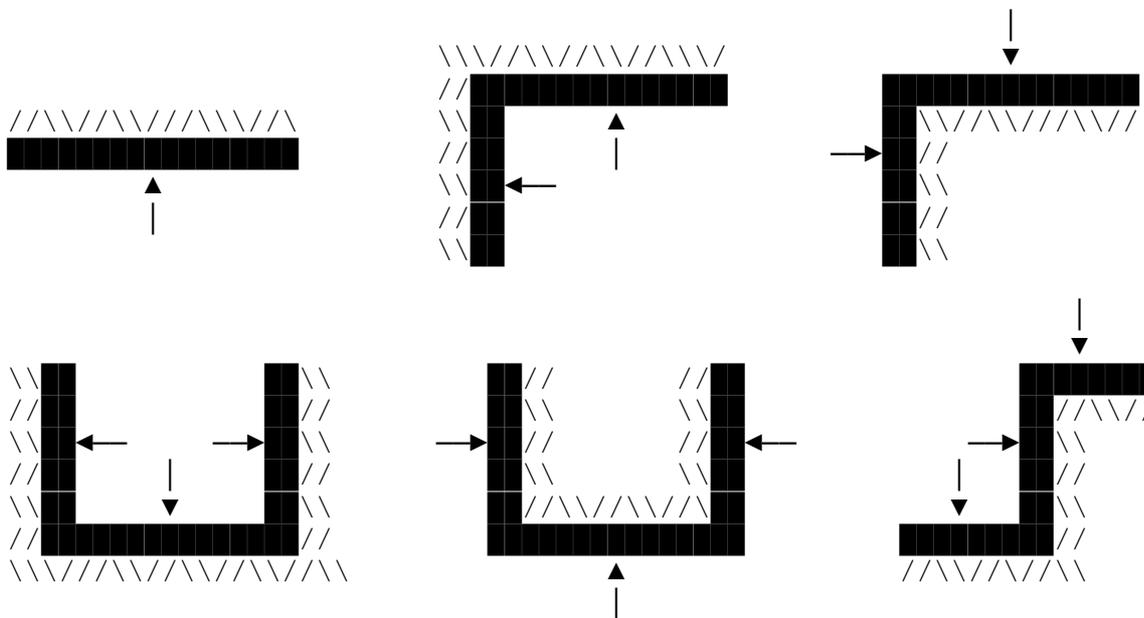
TYPICAL PLANS ON PROPPED RETAINING WALLS (arrow shows direction of elevation)
